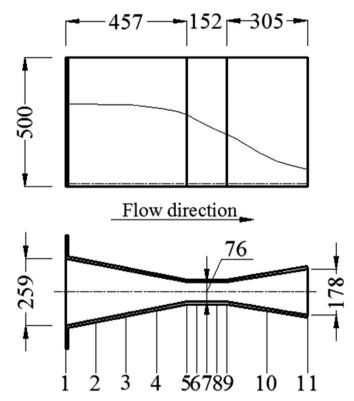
Plan-view and profile-view sketches and cross sections of portable short-throat flume (Unit: mm).
